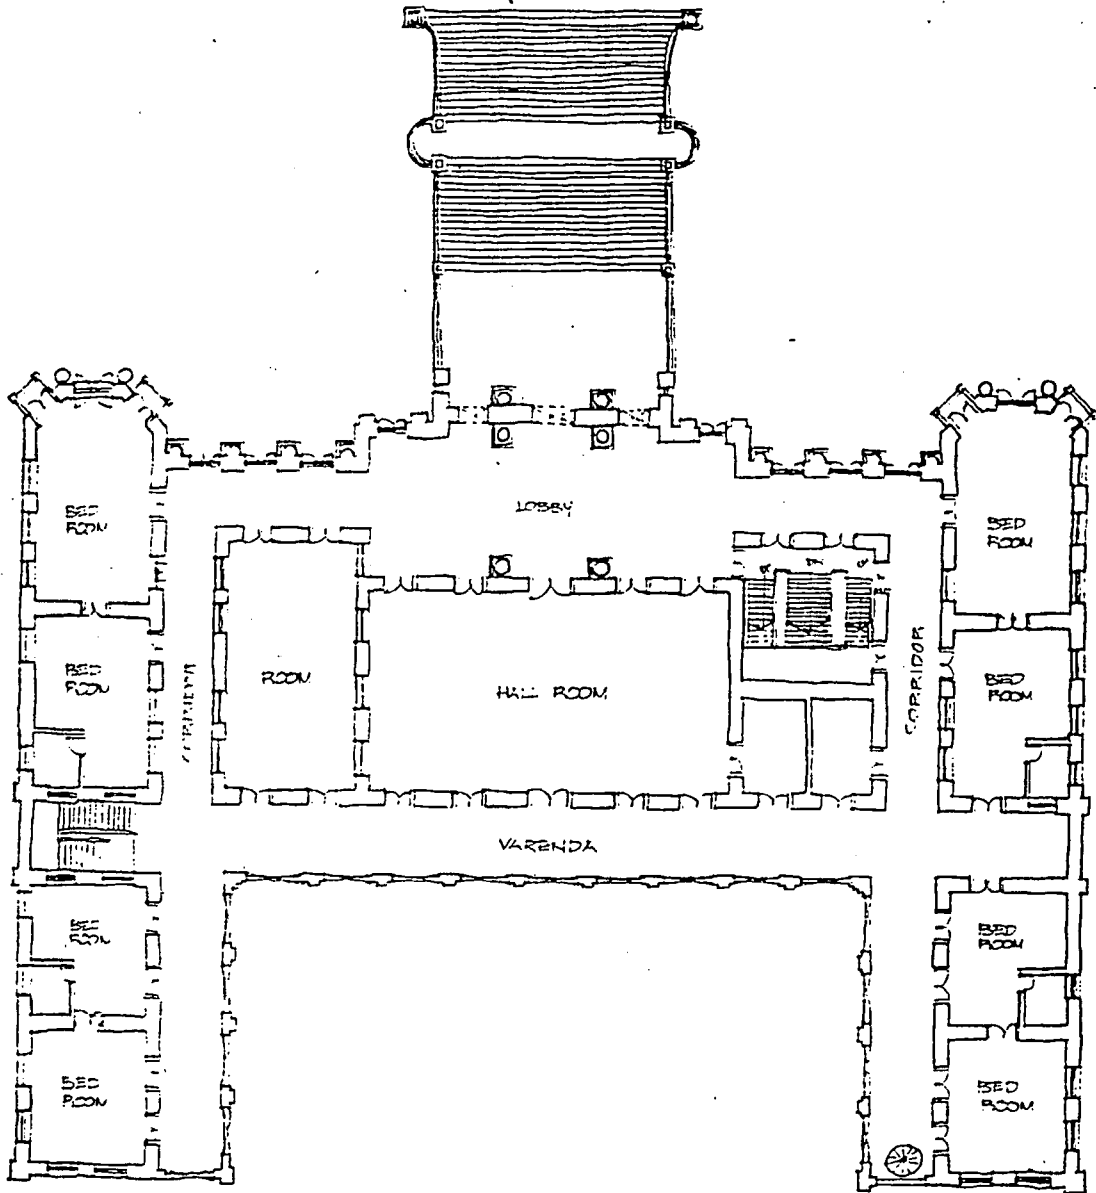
First floor plan, Tajhat palace Rangpur
